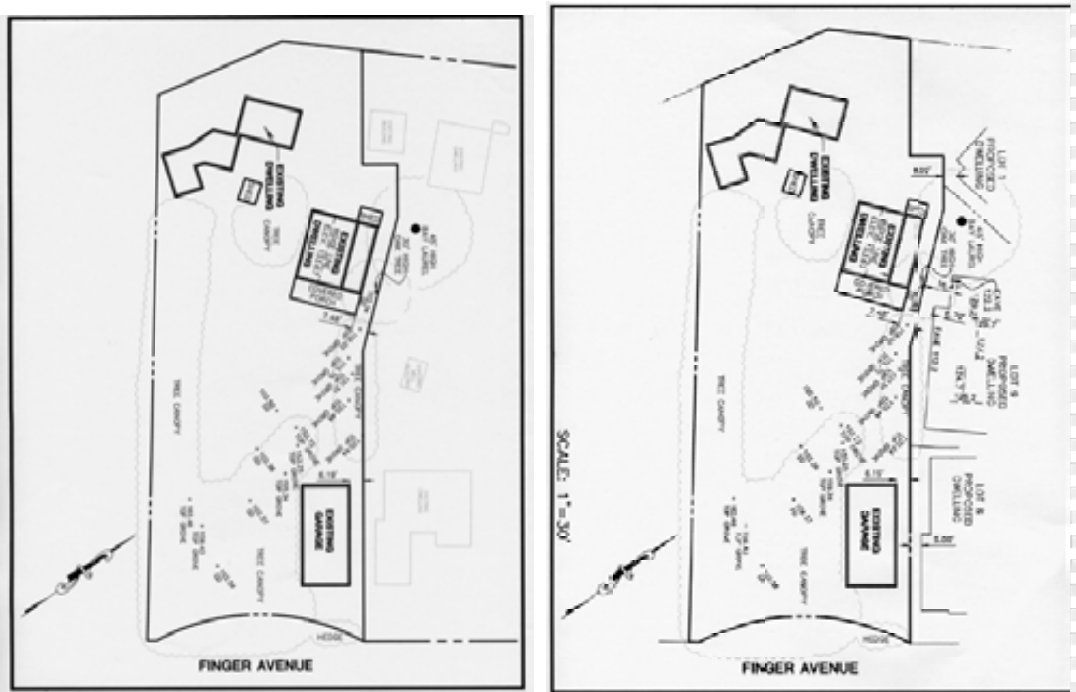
Site plan of Finger Farm House and Existing Structures (left) versus Proposed (right)
